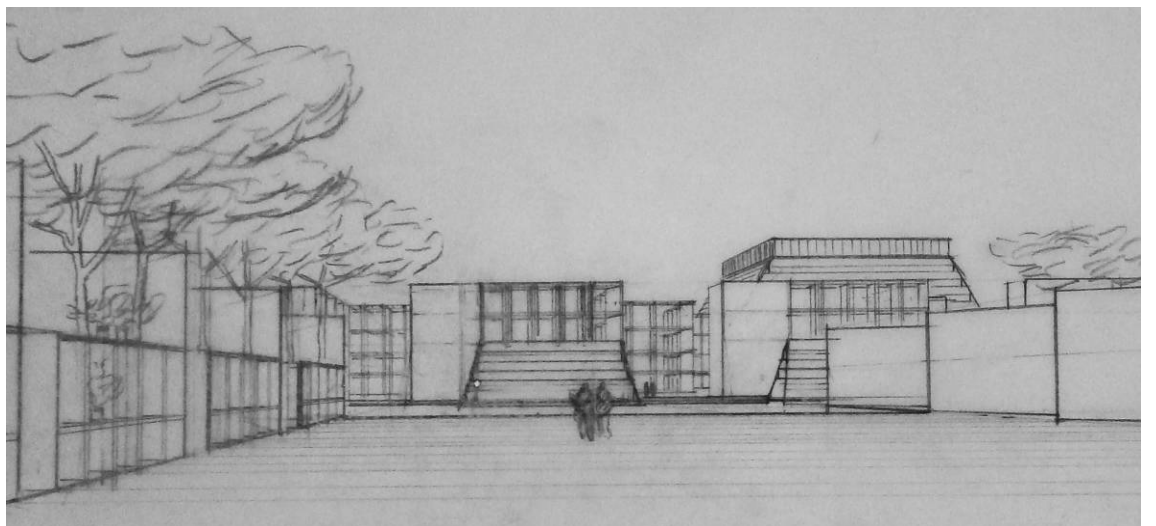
Perspective sketch of Dormitories with Main School building in background, July 1963.
